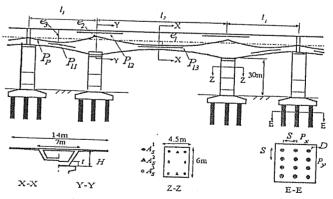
A three-span continuous prestressed concrete bridge system and design variables
